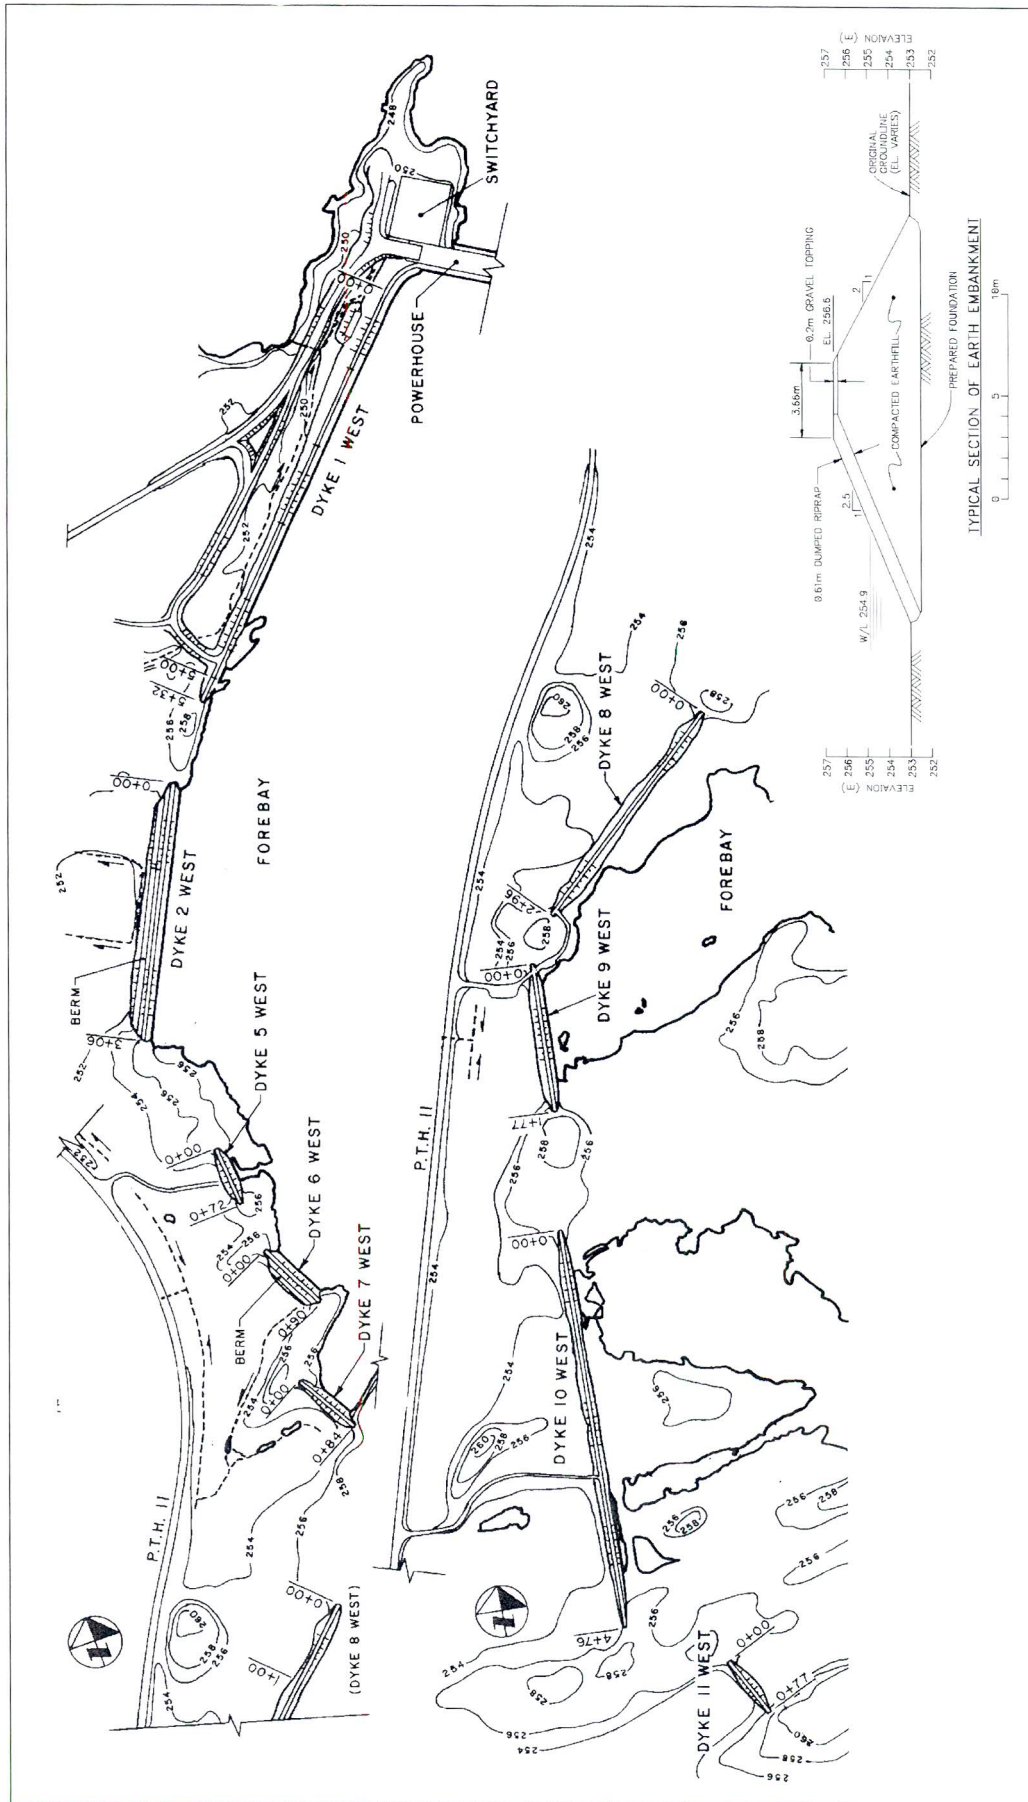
West Dykes (1 to 11) - Plan and Typical Cross Section
